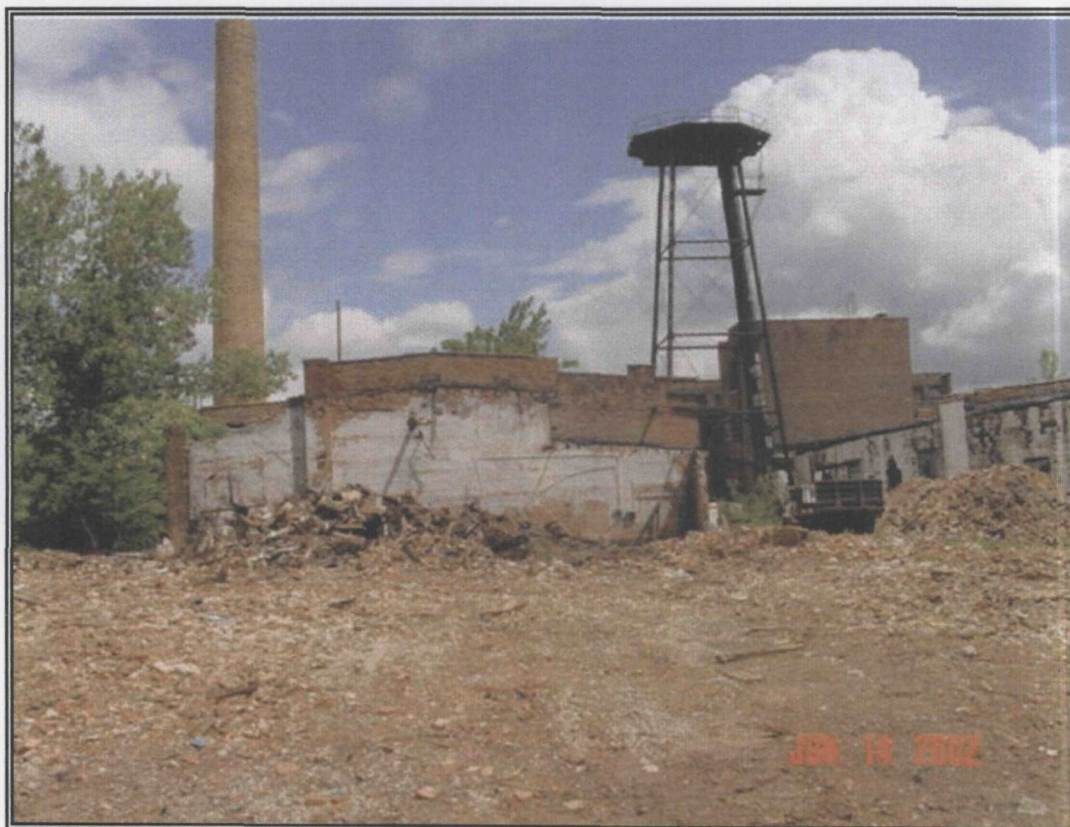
(Site Assessment Preliminary Visit, 14 June 2002) - View of the site facing north.
